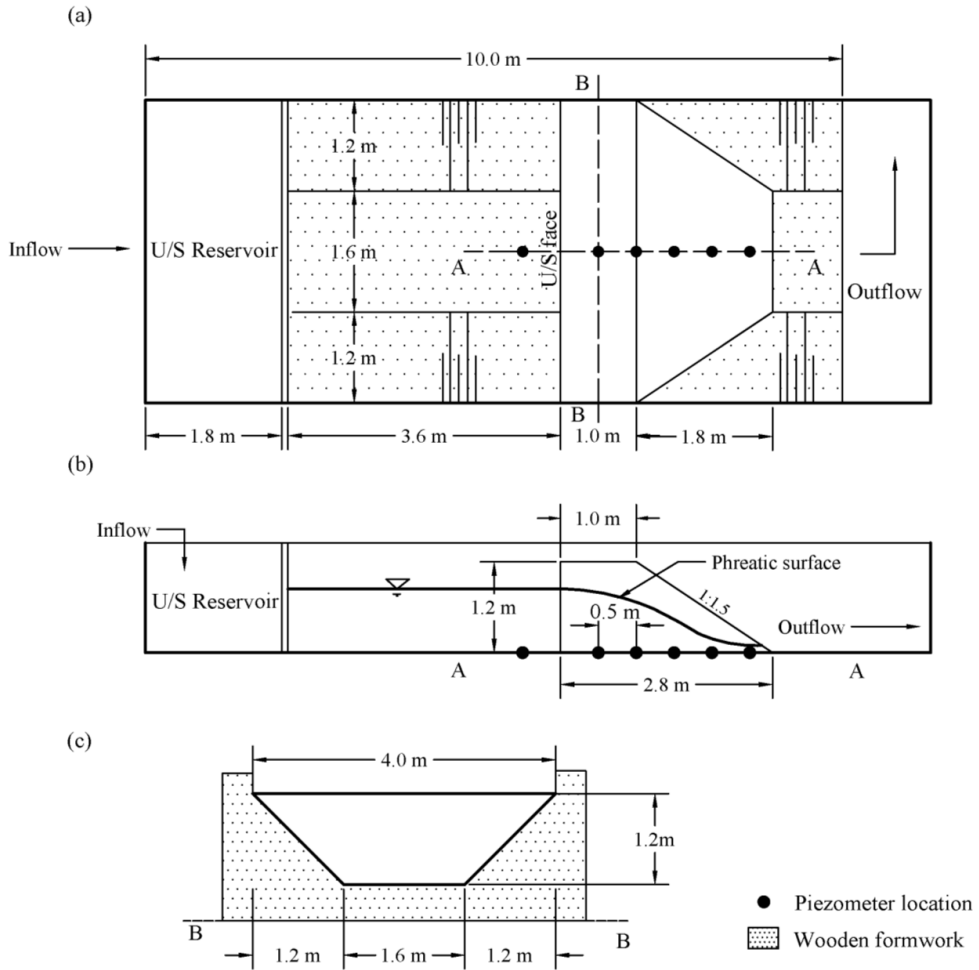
(a) Depiction of the planar design details; (b) Cross-sectional design details (along axis A-A); (c) Longitudinal-sectional design details (along axis B-B) of the 1.2 m test rockfill dam (M3) constructed at the hydraulic laboratory of NTNU, Trondheim.
